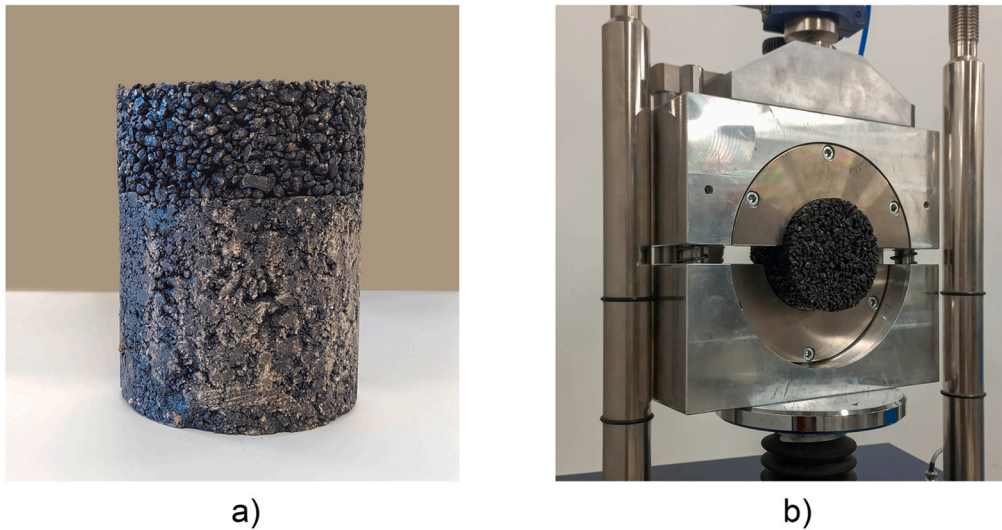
Interlayer shear bond test: a) Composite specimen b) Leutner head.
